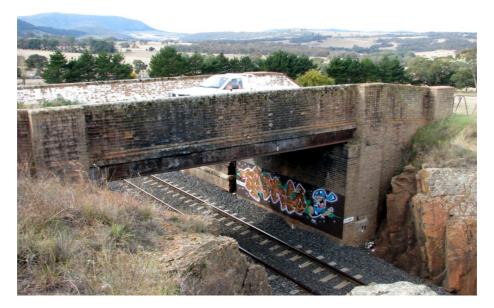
F82 A replacement bridge with steel frame and brick balustrade
